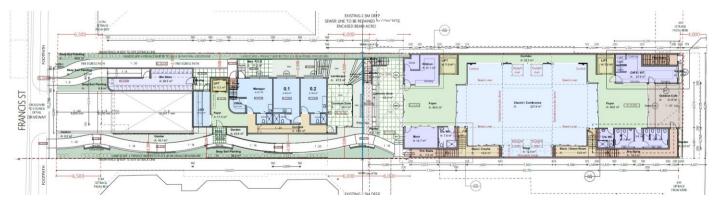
Ground Floor Plan – 28 Fisher Rd, Dee Why
